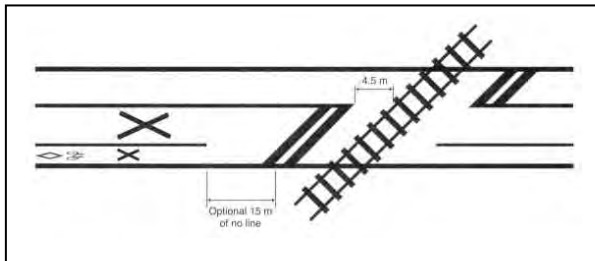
Skewed Railroad Crossing Restricted Right-of-Way Width
